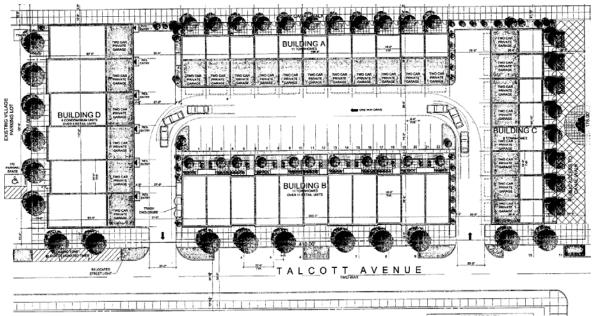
The original site plan from the 2004 PUD and Rezoning ordinance illustrates the existing approvals and building configuration.
